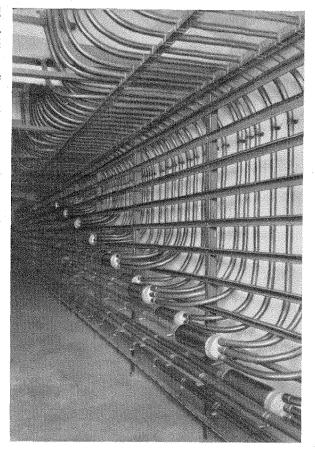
Modern installation of underground entrance cables of the Jordan central office, Madrid.
